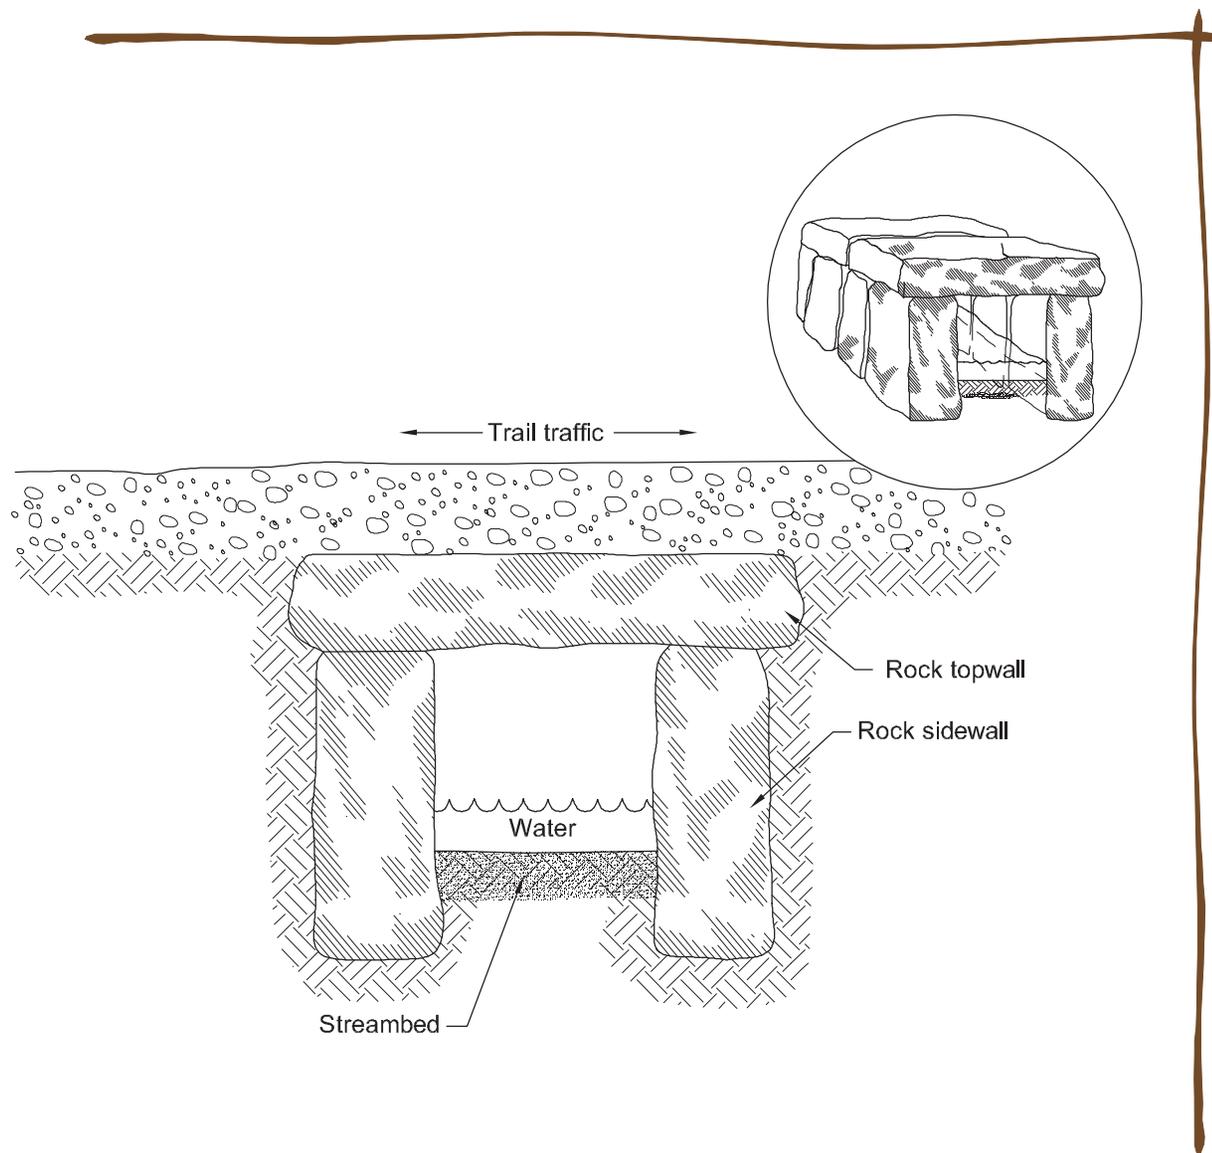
A rock culvert. Stones may also be laid along the bottom of the culvert.
